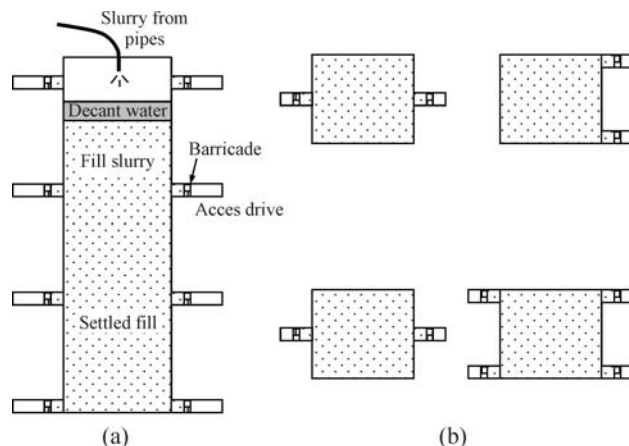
Schematic diagram of a mine stope with access drains: (a) front view of a stope; (b) possible drain layouts in plan view.
